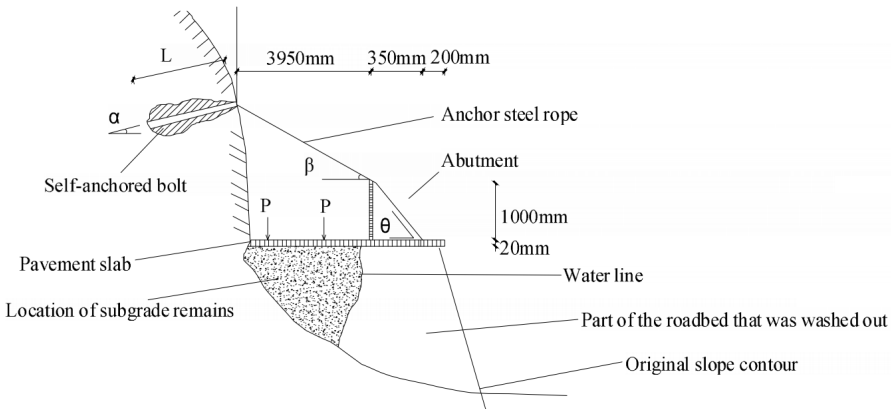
Schematic diagram of anchoring technology of suspended pavement slab
